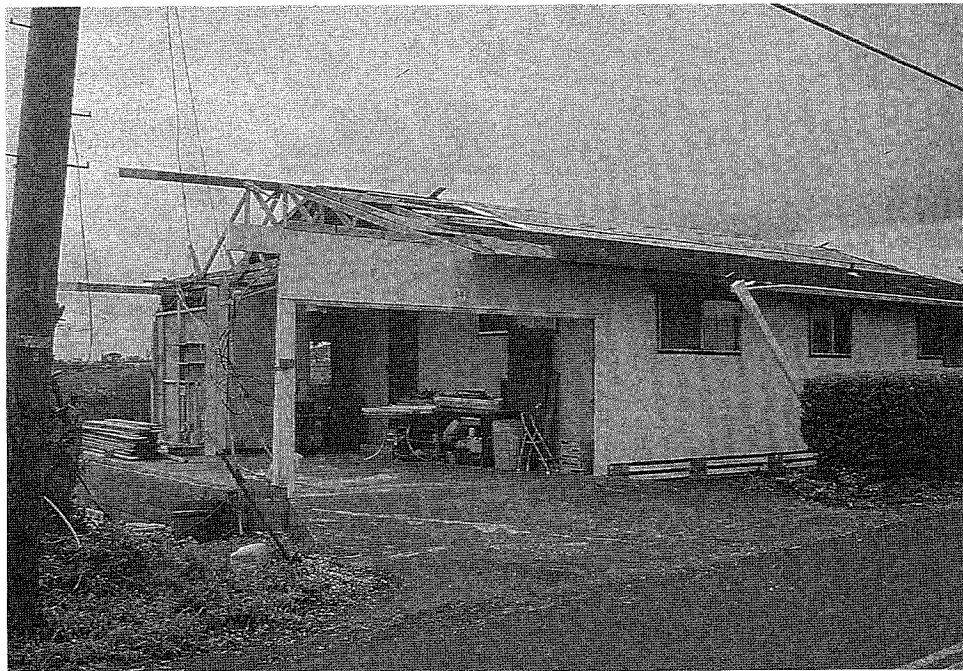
Site-built trusses on a single-wall home with lapped and nailed joints in lieu of metal or plywood gusset plates.
